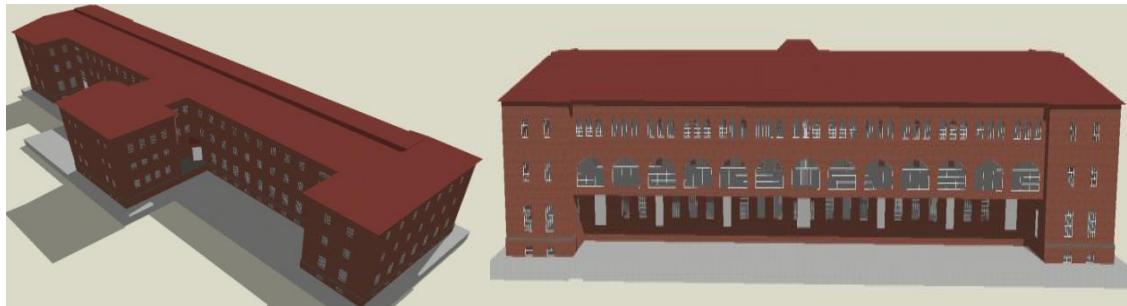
Building 101 model (Left: Building East Façade; Right: Building West Façade) (Xu, 2012)
